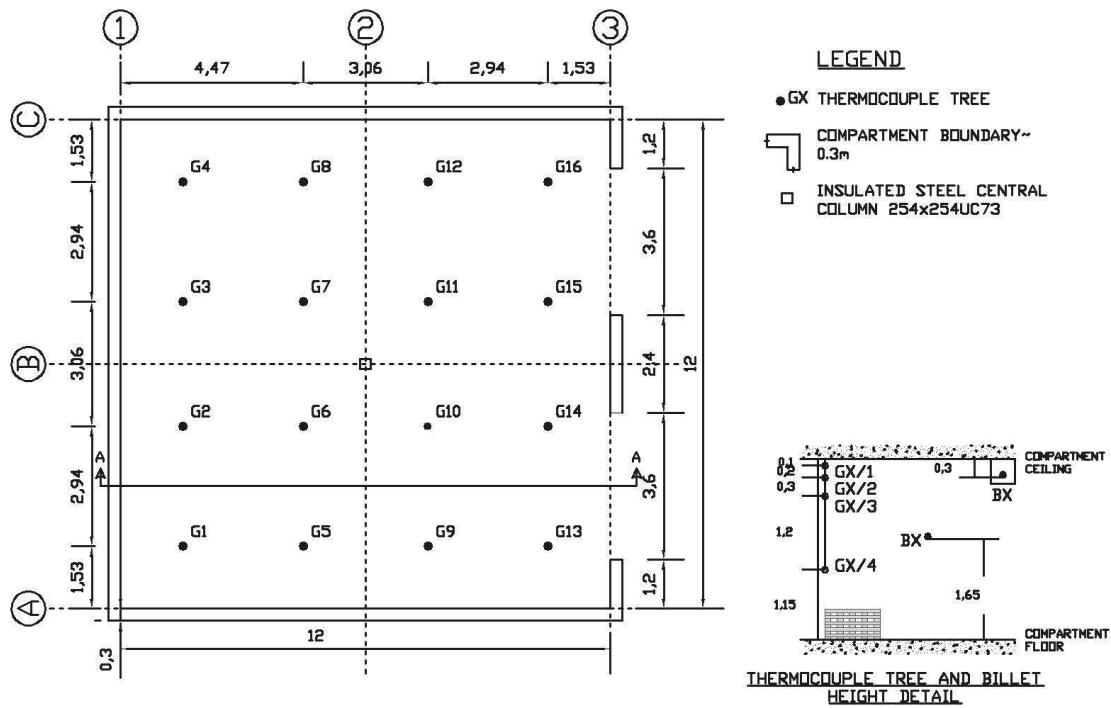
Plan and elevation of fire compartment showing dimensions and thermocouple tree locations; ventilation openings on the right (test 8).
